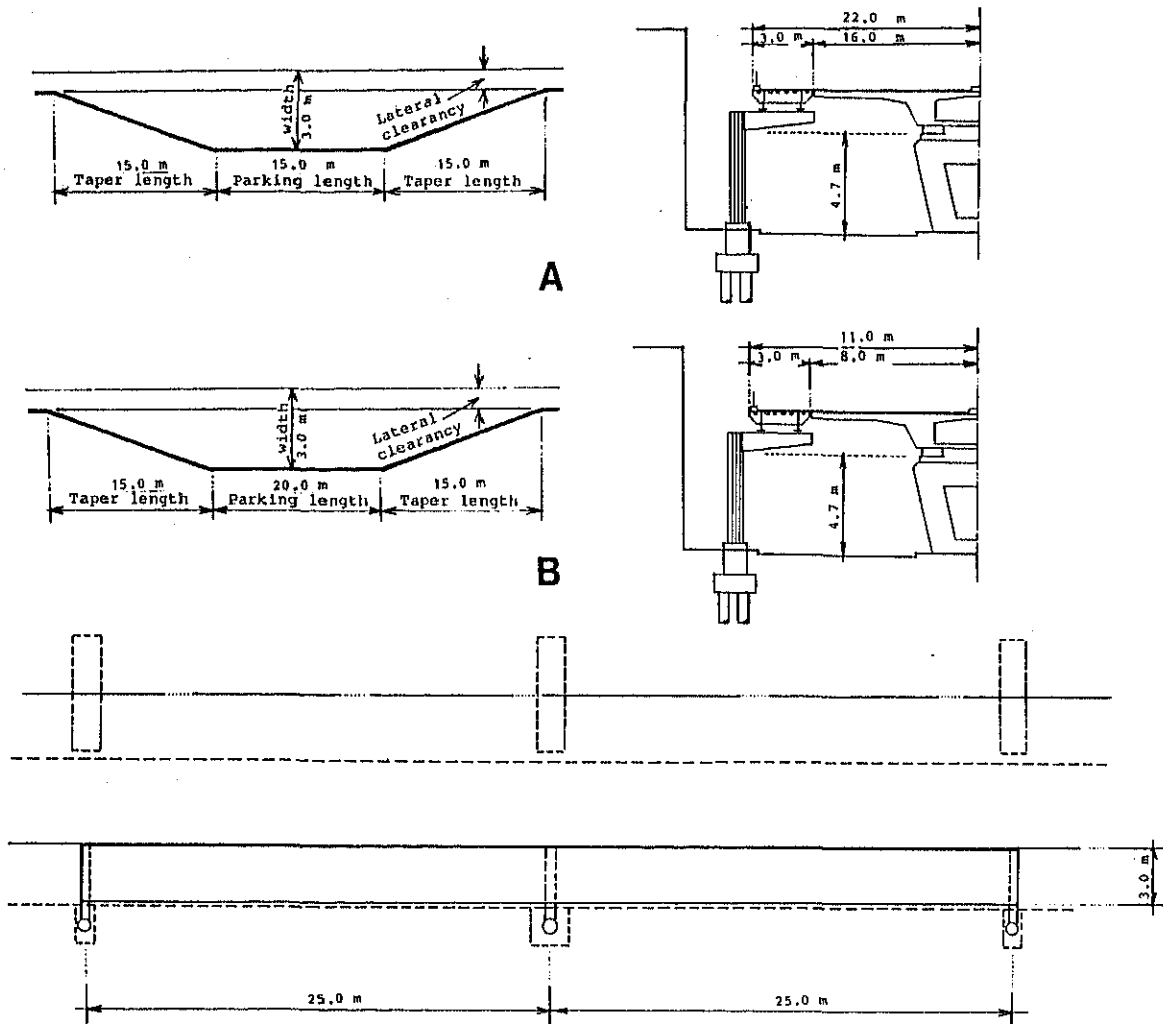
Standard Structure of Emergency Parking Bay
